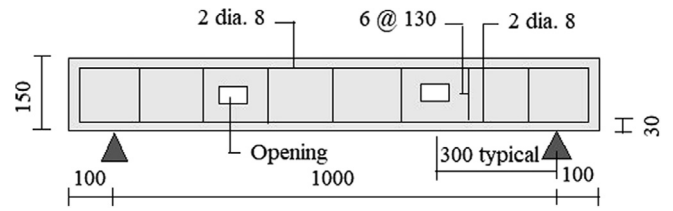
Details of tested beams with web openings (all dimensions in mm).
